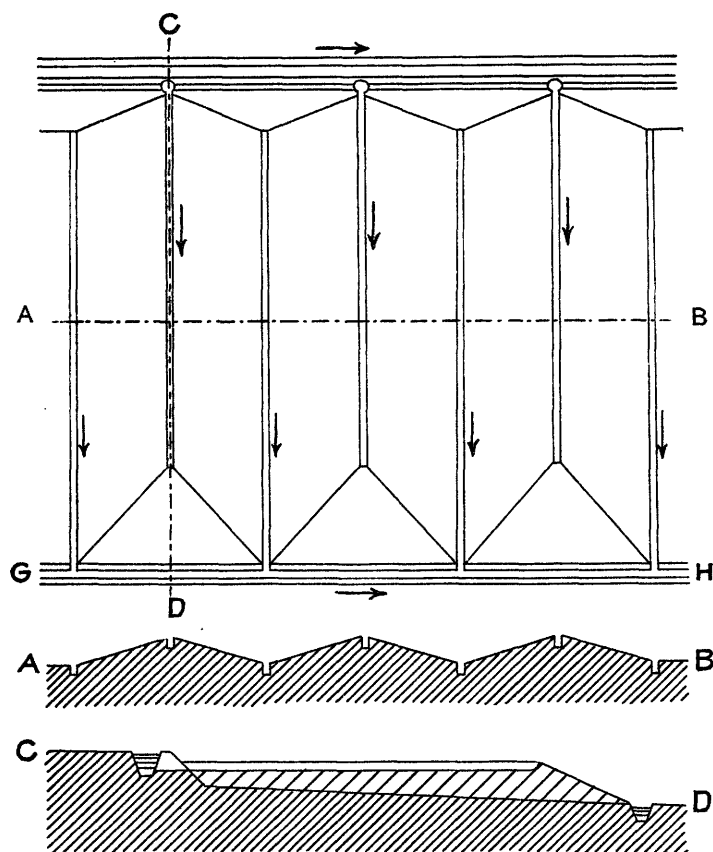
Plan and sections of ridge-and-furrow irrigation (Ronna, p. 438).
